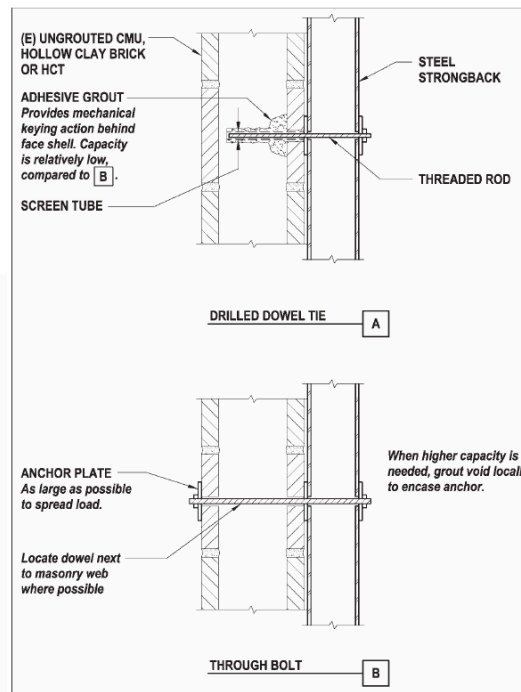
Connection of Strongback to Hollow Masonry
